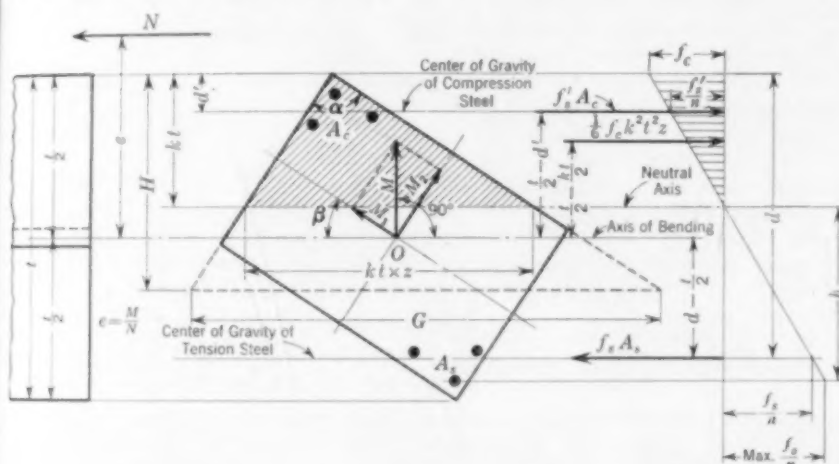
CROSS SECTION of rectangular reinforced concrete column shows stresses under axial compression and bending, with tension over part of section. Only steel in north and south corners is considered. Steel in east and west corners is inconsequential.
